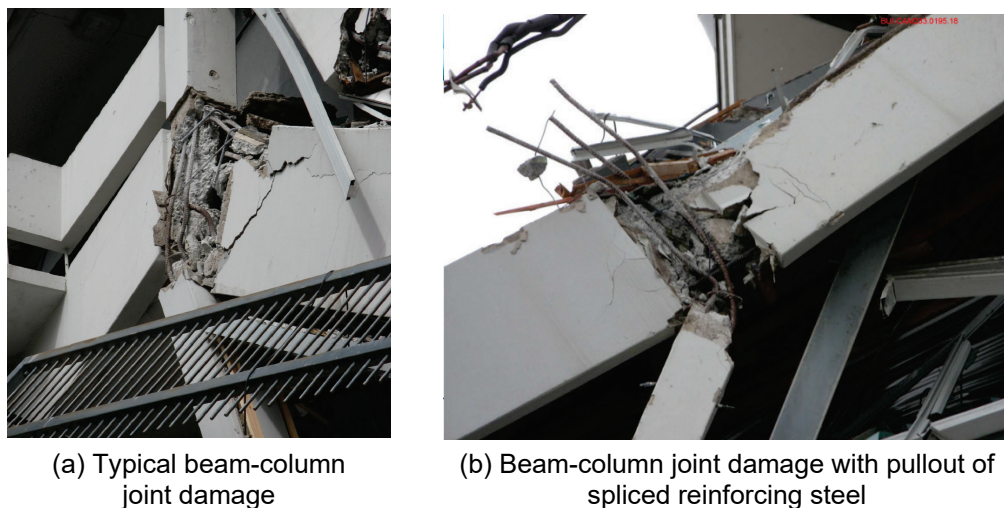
Photo of damaged beam-column joints (Jury and Sharpe, 2011).
